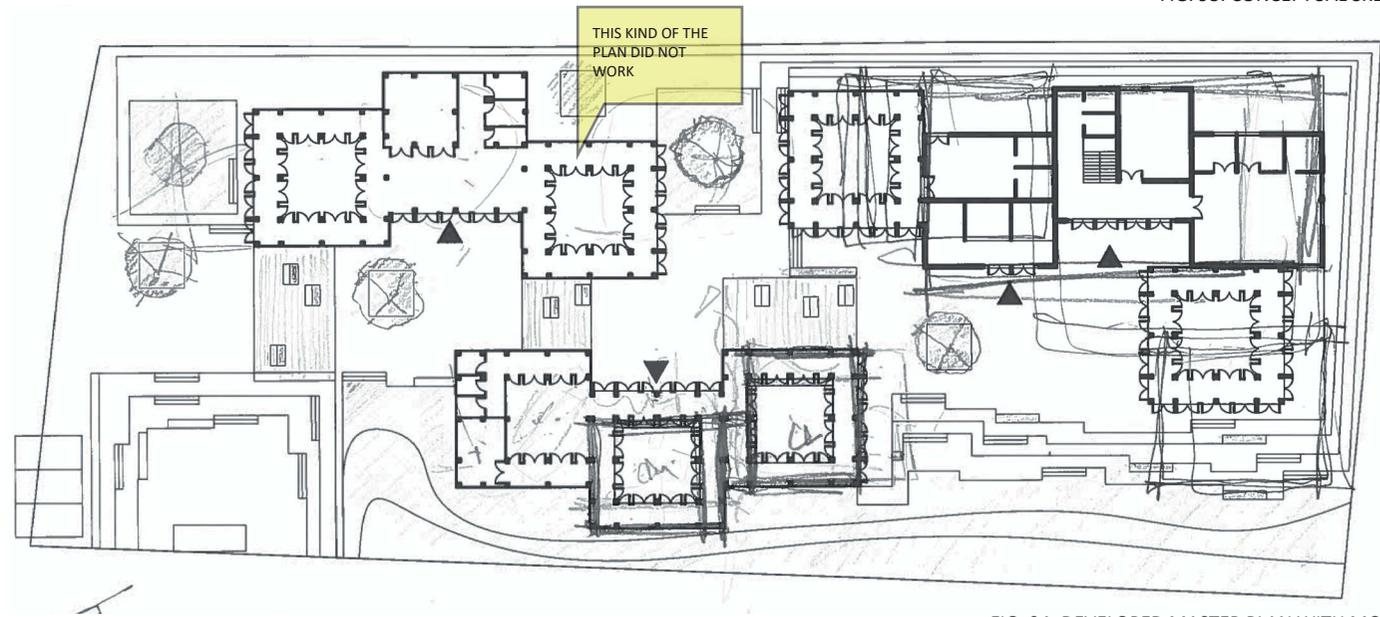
DEVELOPED MASTER PLAN WITH MODULES
